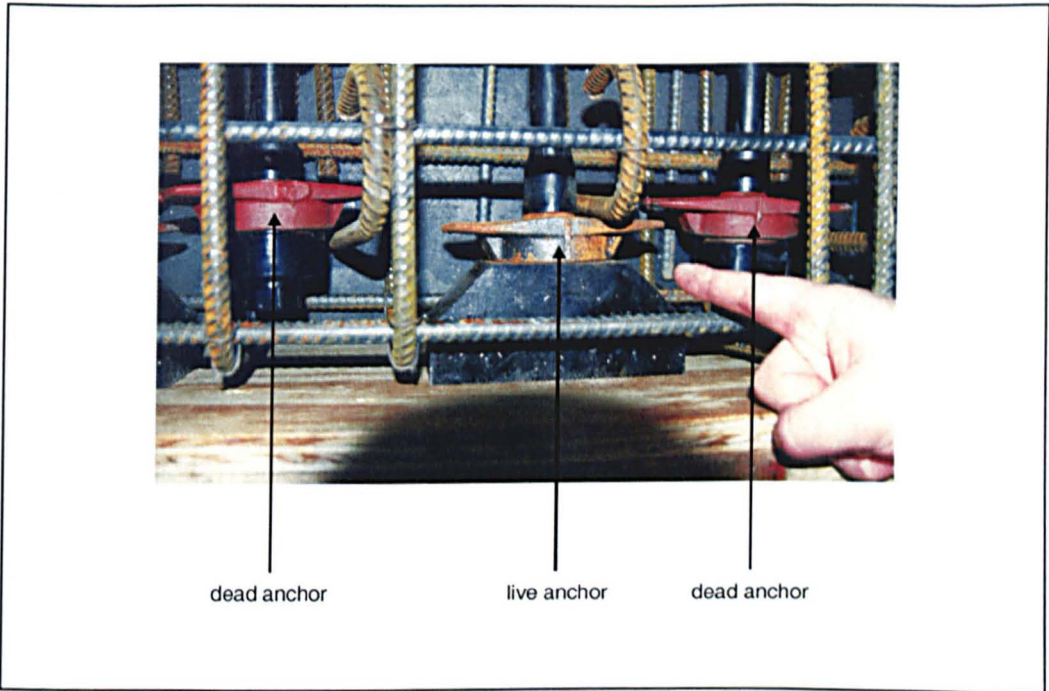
Structure C - Alternate Dead and Live Prestressing Anchors.
